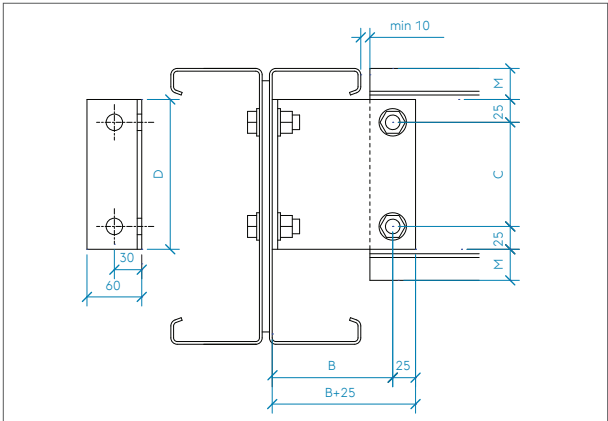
Detail of one-sided floor beam connection to a C+ girder
